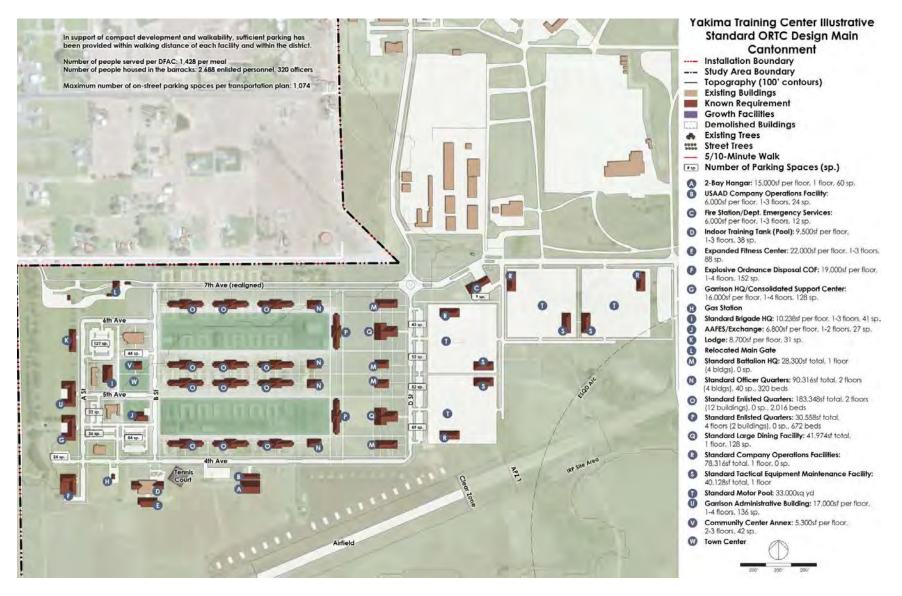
Yakima Training Center Area Development Plan Illustrative Plan
